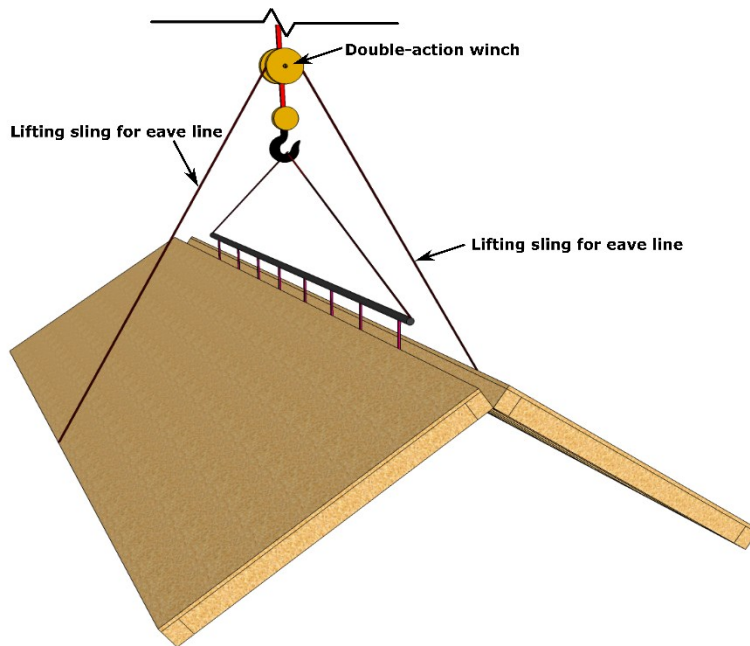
Roof panel at proper angle by double-action winch rigging system.
